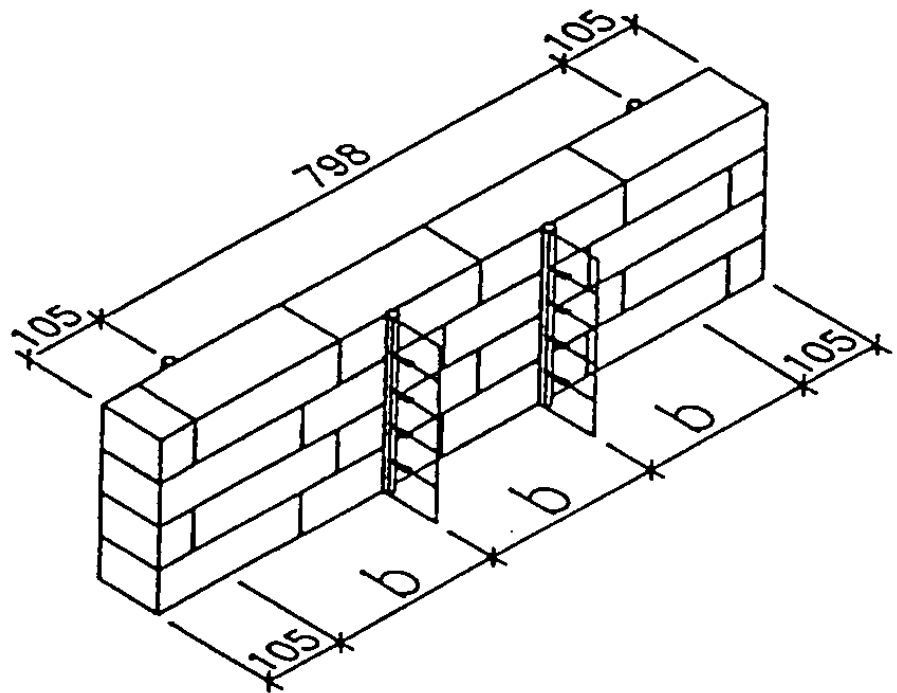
Test specimen and loading arrangement for the determination of the bending properties of masonry walls.
